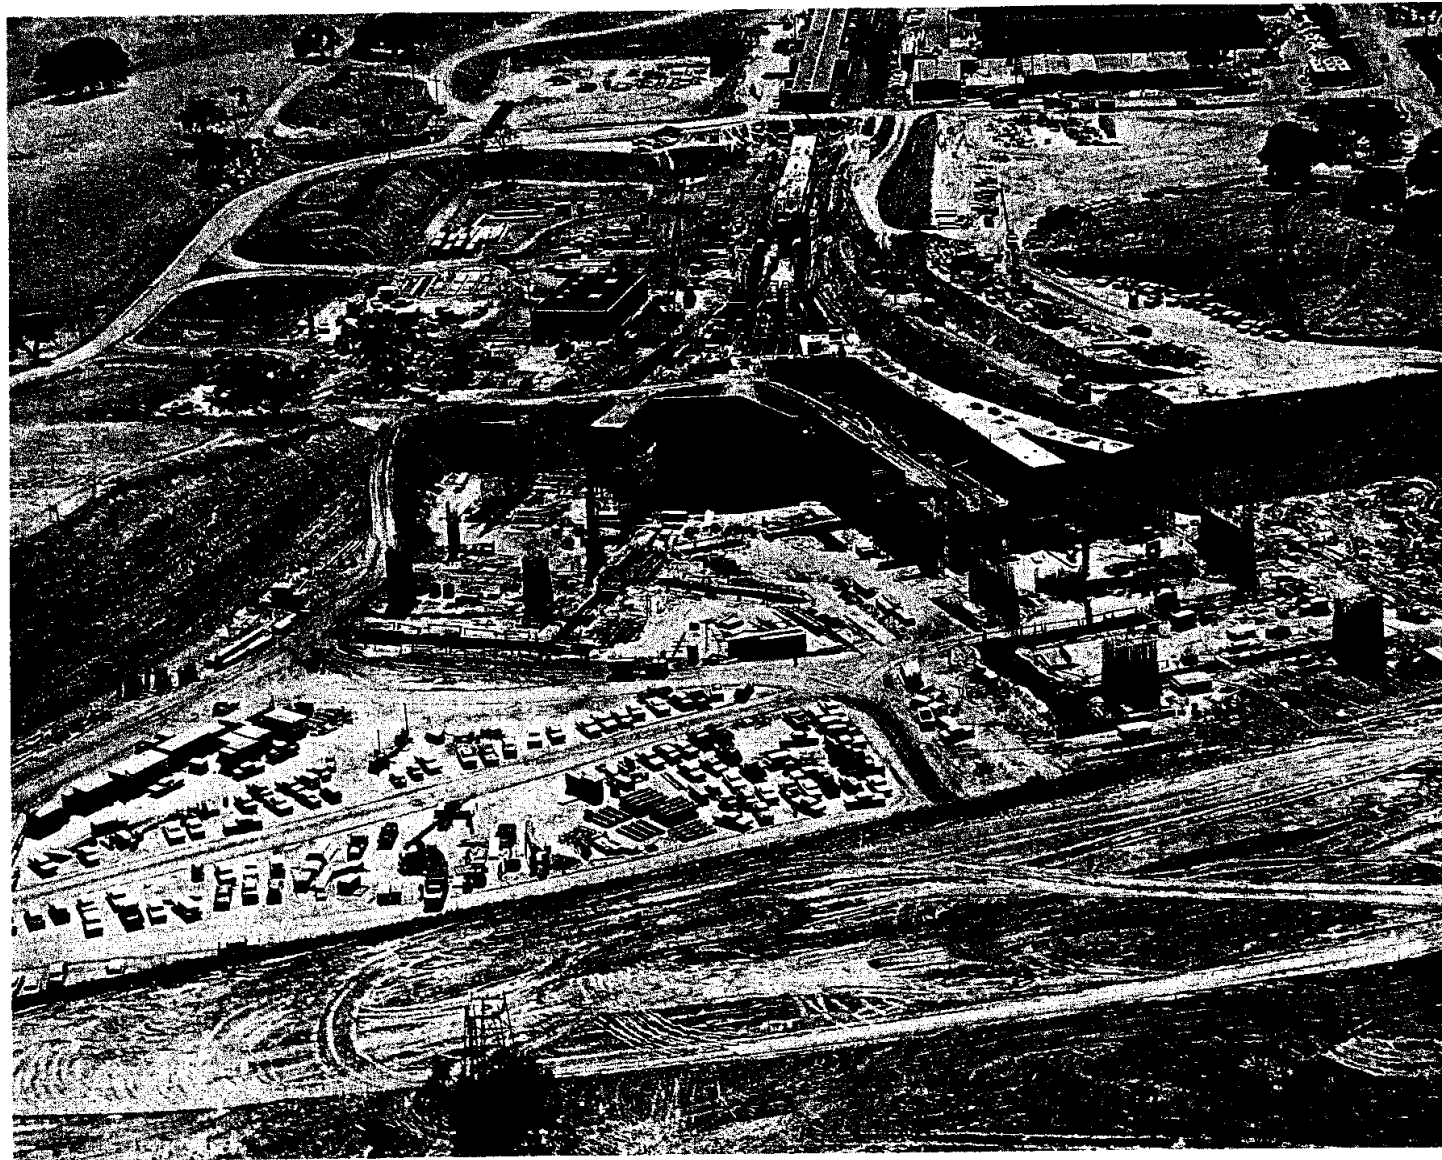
Beam Switchyard and End Stations A and B under construction.
